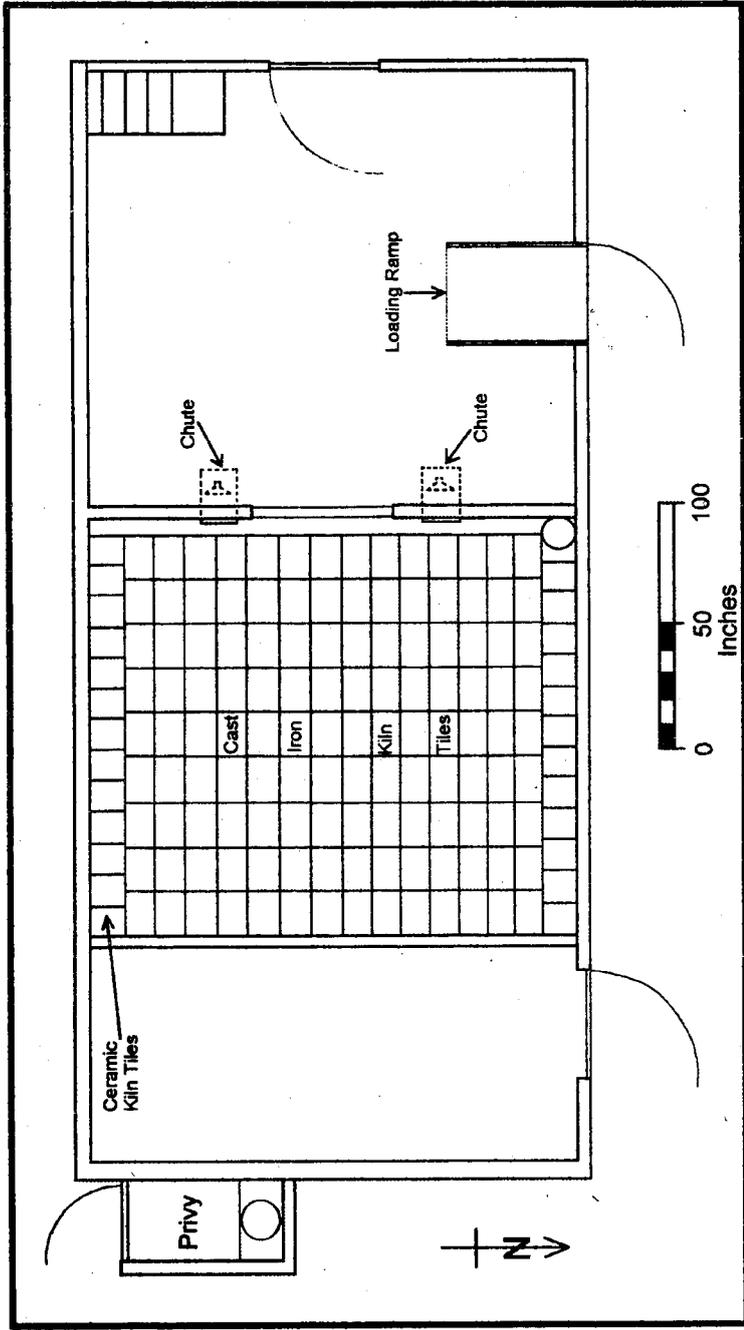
Plan view of the interior of the Kiln & Storage Building.
